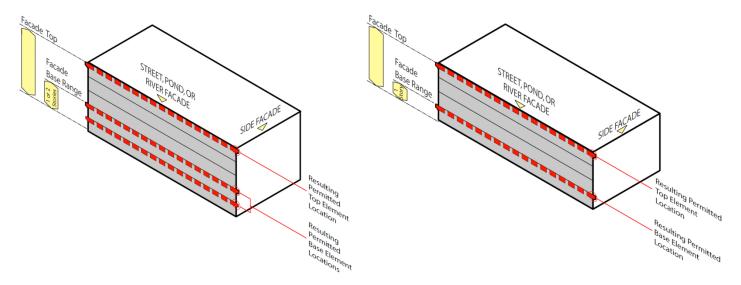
Horizontal Modulation - Façade Base and Top Elements
